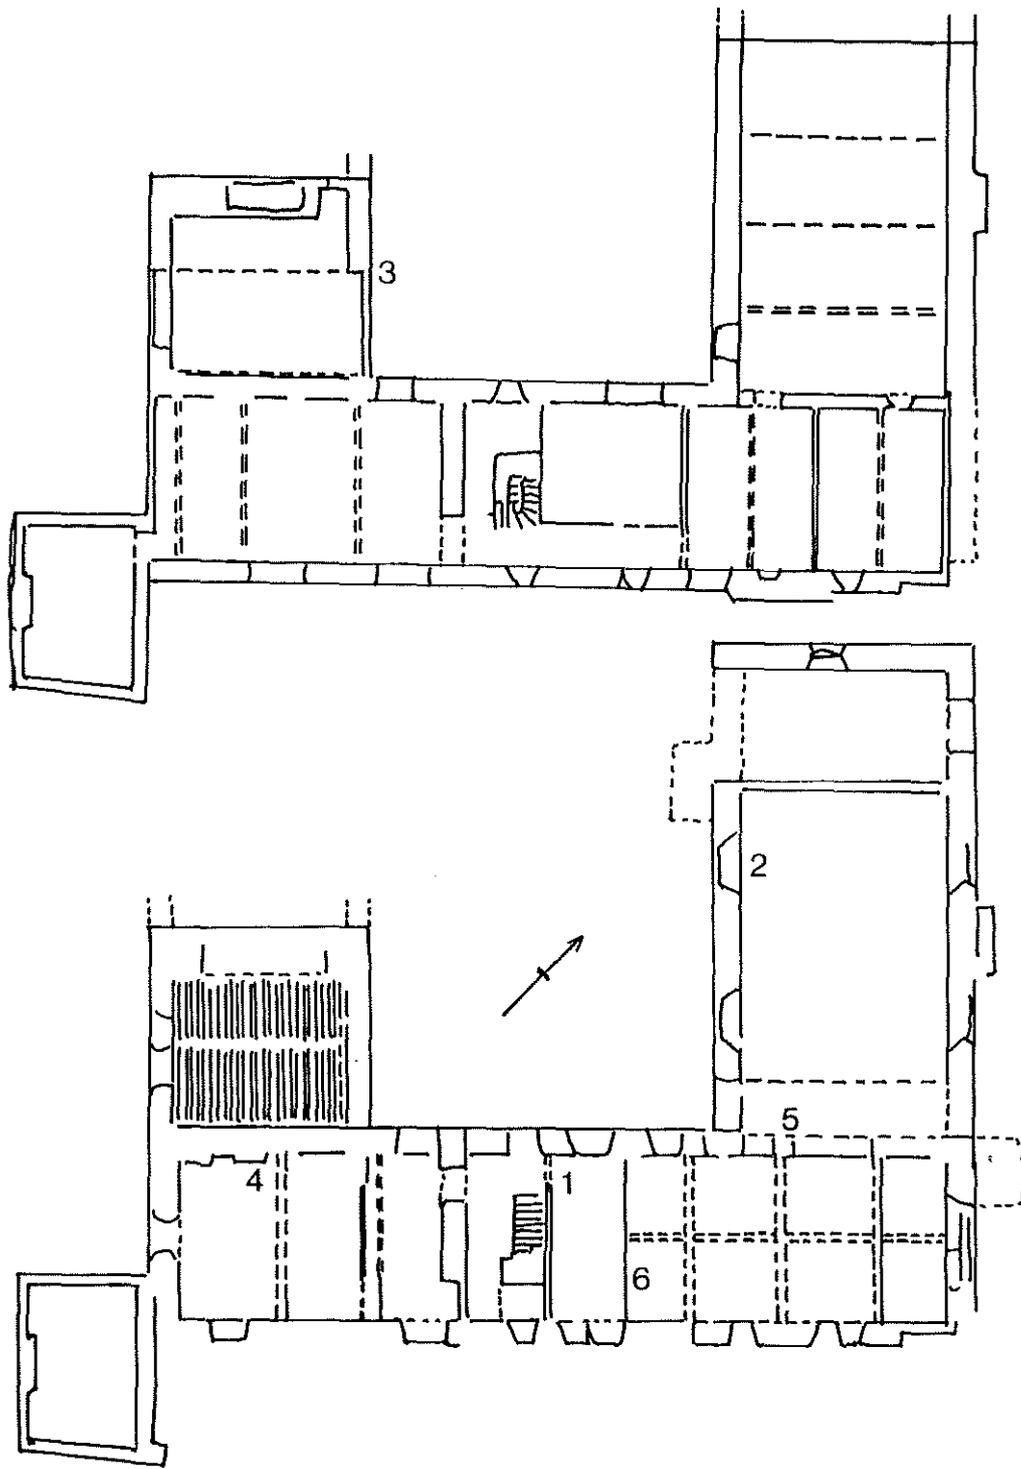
Plan of Bowhill House (after Everett 1958). Top - upper floor; bottom - ground floor.
